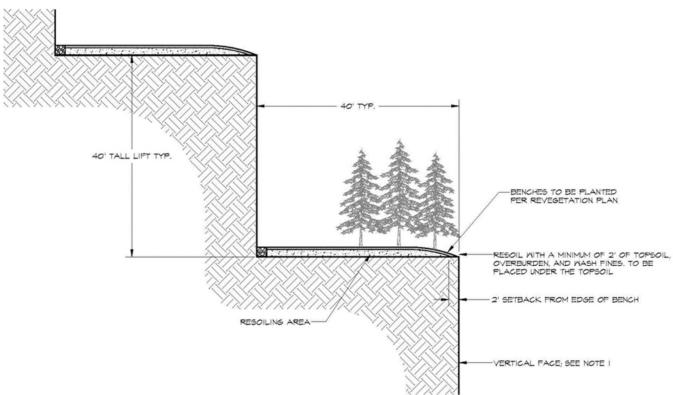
UPPER BENCHES PLANTING CROSS-SECTION
